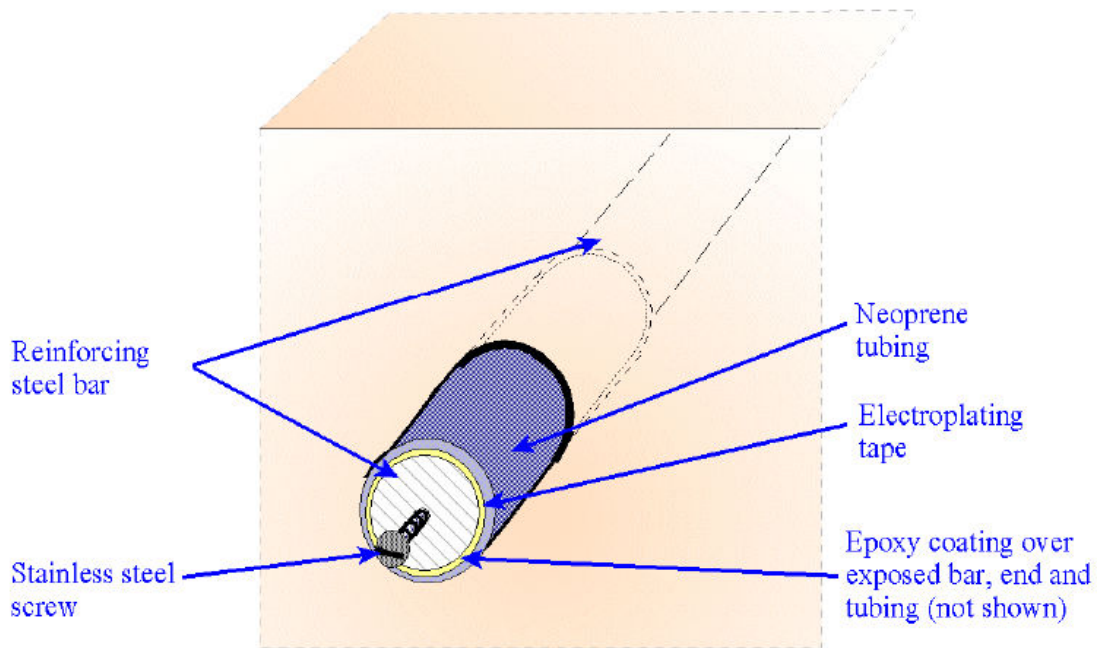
Detail of Reinforcement Ends (Brown, M.C. 1999)
